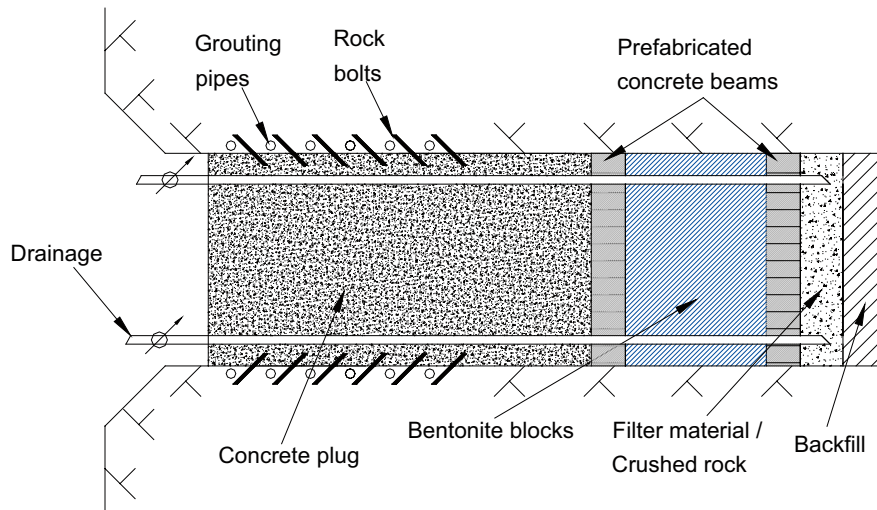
Long Concrete Plug – Bentonite Block (LCBB) with Upstream Filter.
